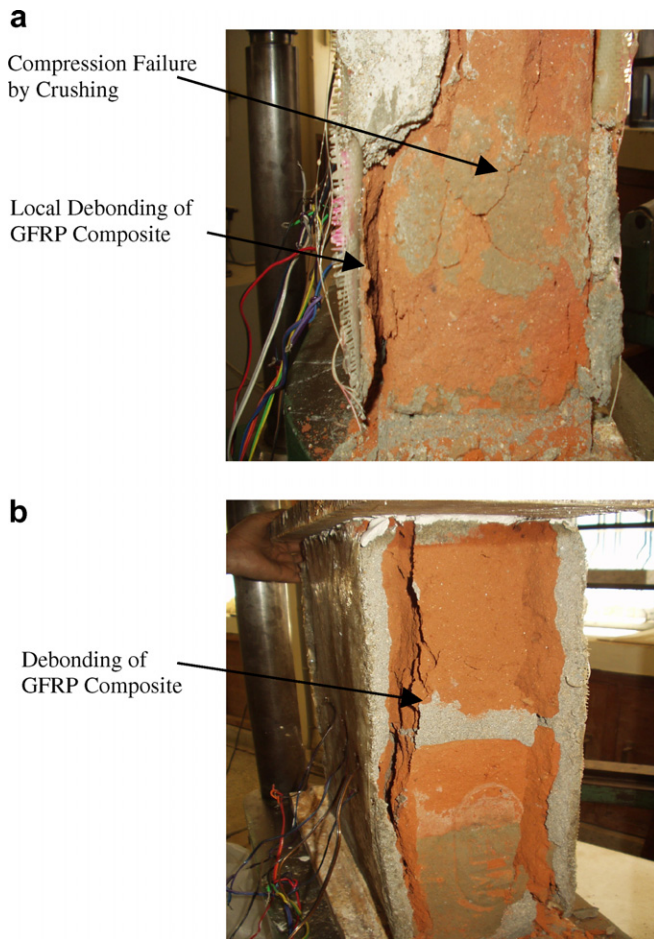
Failure modes of the wallettes under compression: (a) loading normal to bed joints and (b) parallel to bed joints.
